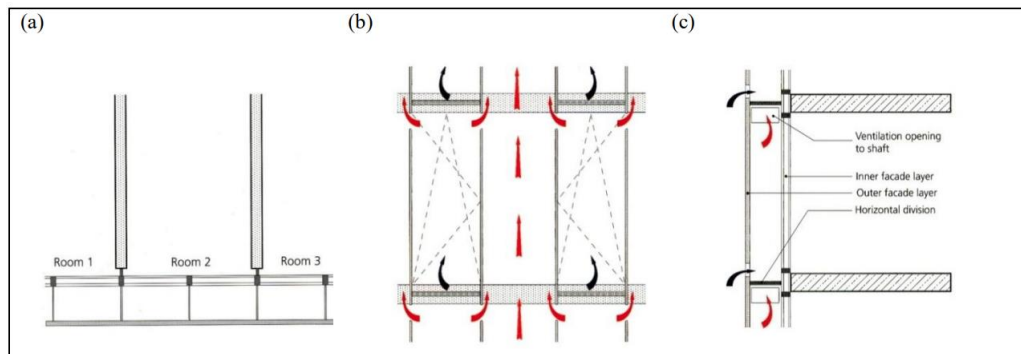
Shaft box facade: Plan (a), section (b) and elevation(c) (Osterle, 2001).
